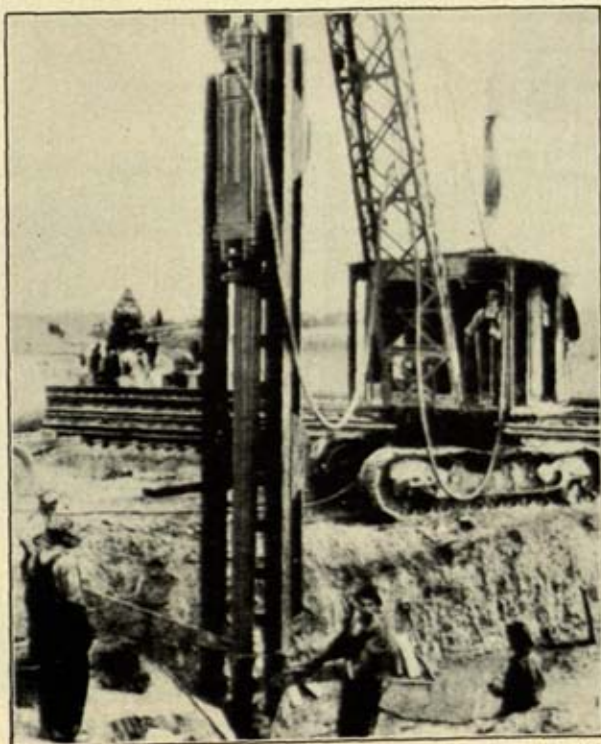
Double-acting steam hammer driving monotube pile. (McKiernan-Terry Corp.)
